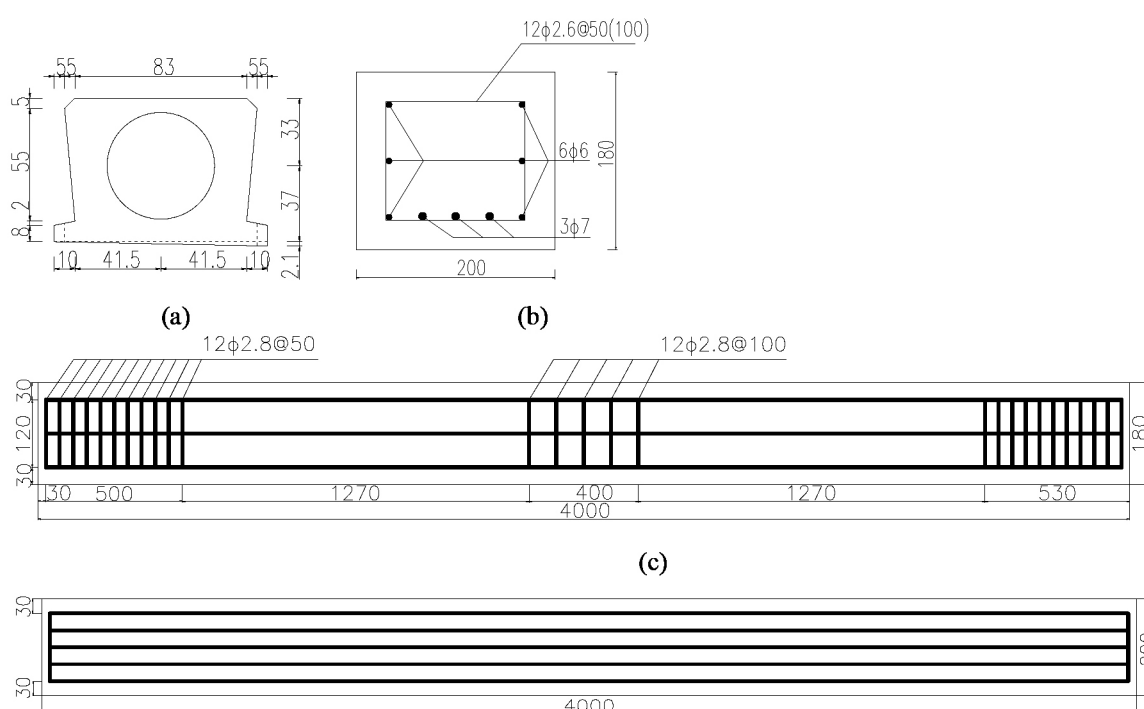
Structure diagram of the beam structure. (a) Cross-sectional dimensions of the prototype hollow beam (16 m). (b) Model beam cross section. (c) Elevation schematic. (d) Floorplan
